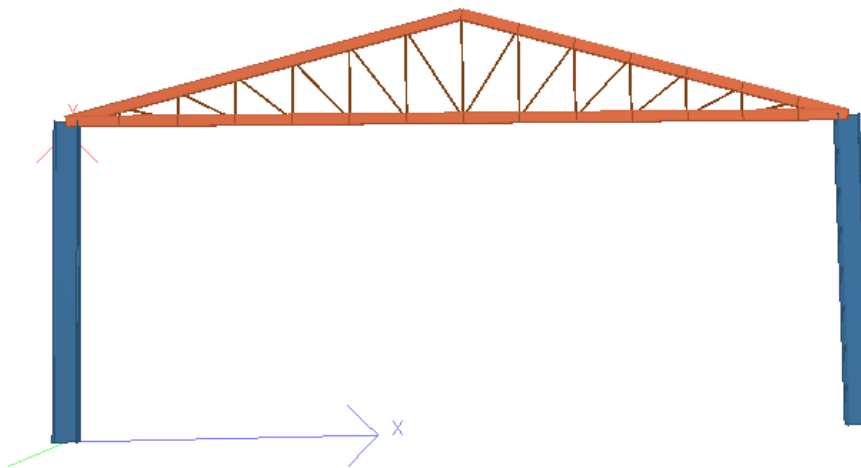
Conventional Steel Buildings (CSB) Section, Hot Rolled section
